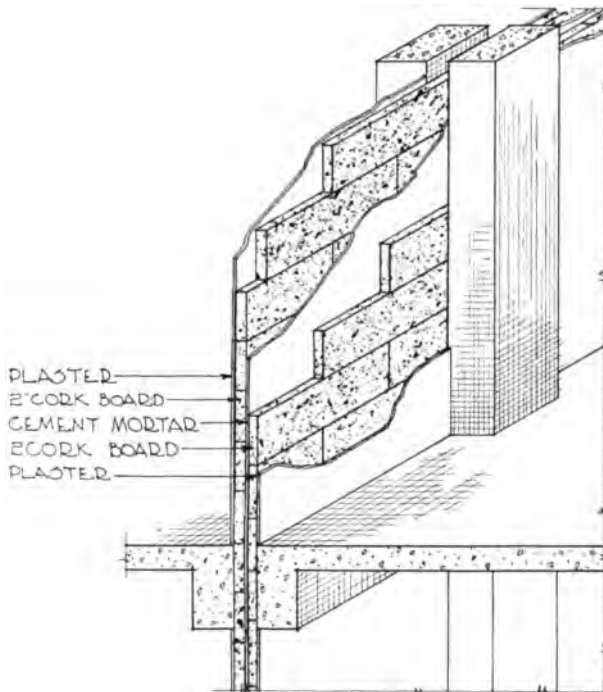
DETAIL OF INSULATION PASSING THROUGH FLOOR.
